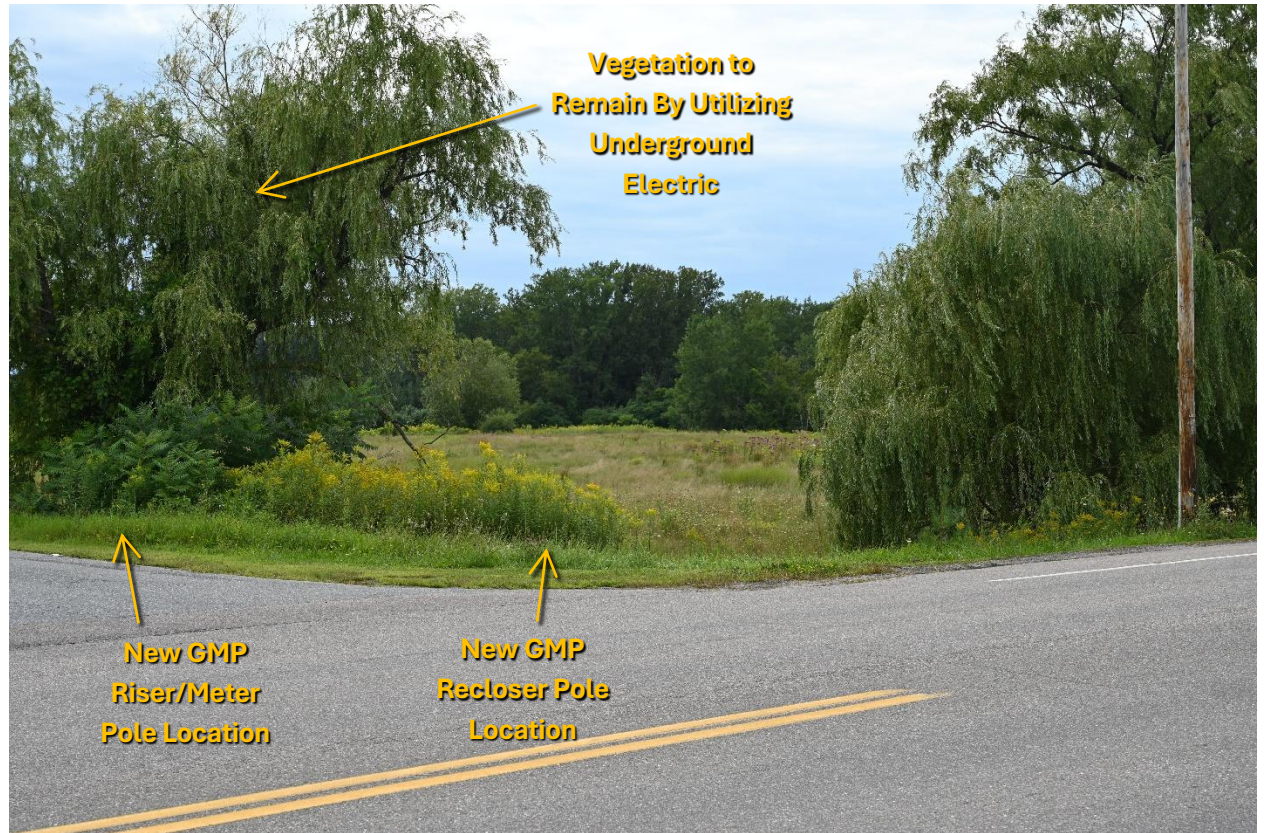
Continued Pan from Image 1. View from Maple Street northeast of the Project site (east of the intersection with Rivendell Drive), looking southwest towards the proposed array and interconnection. (49mm)
